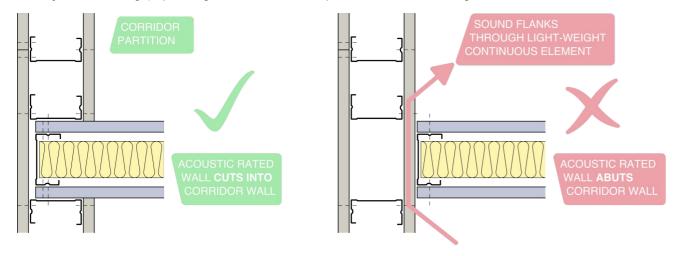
Corridor wall junctions to minimise flanking transmission (acoustic principles only)
